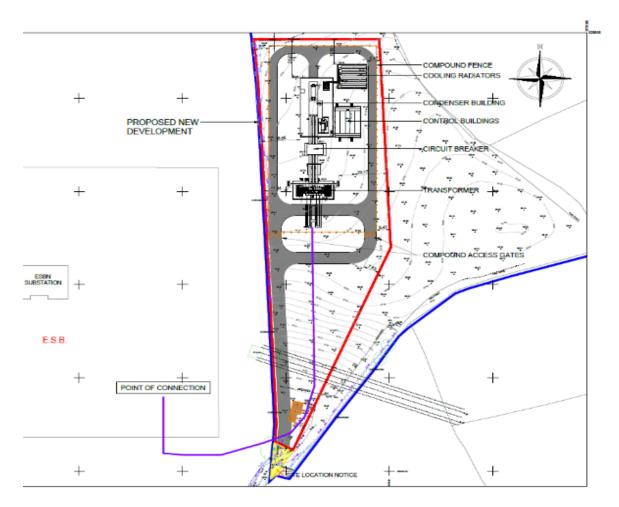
Site Layout (Extracted from the Site Layout Plan)
